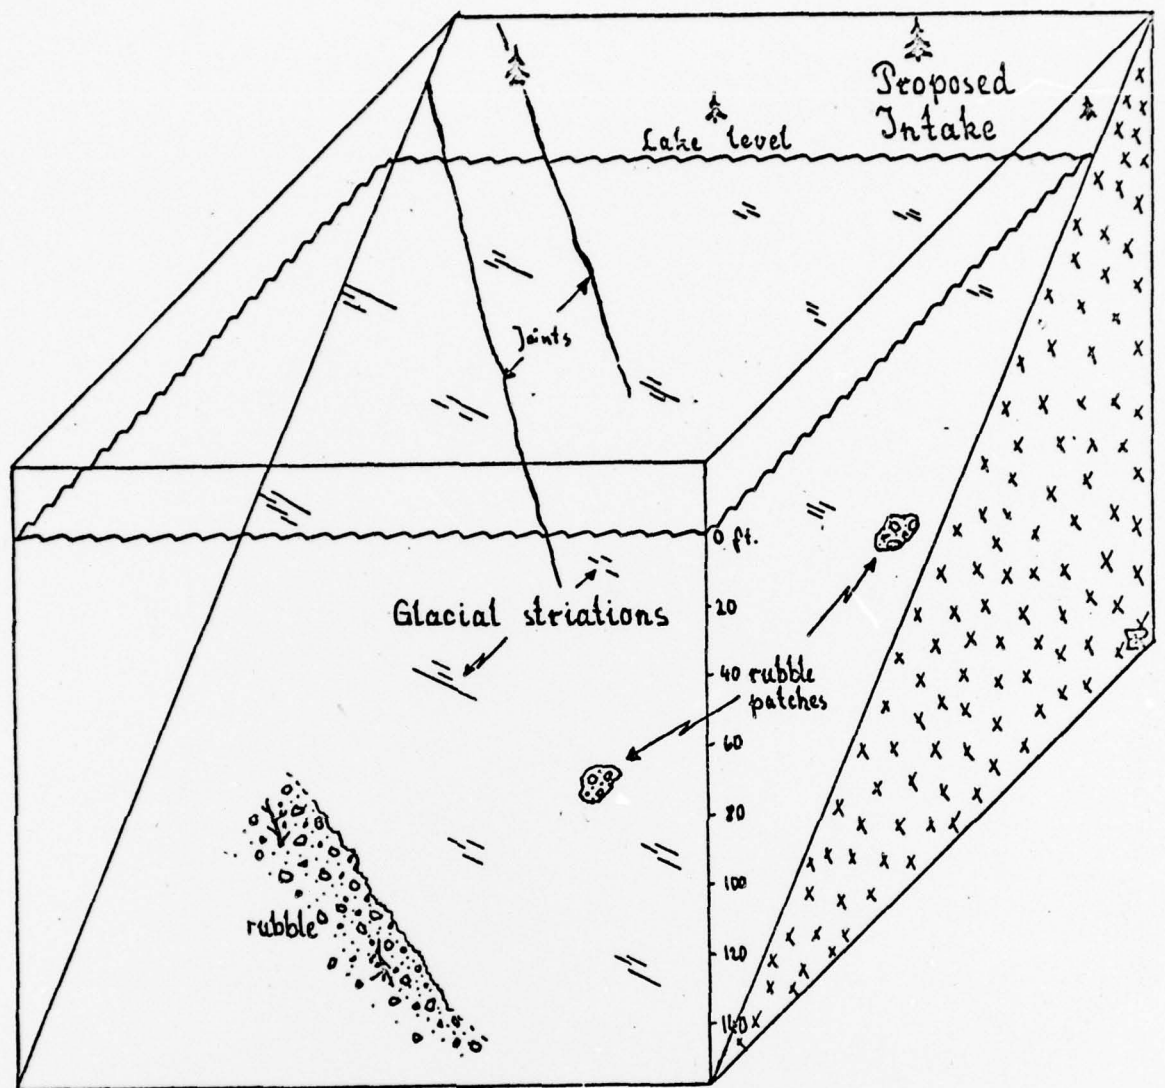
Bottom conditions at proposed intake location, right abutment.
